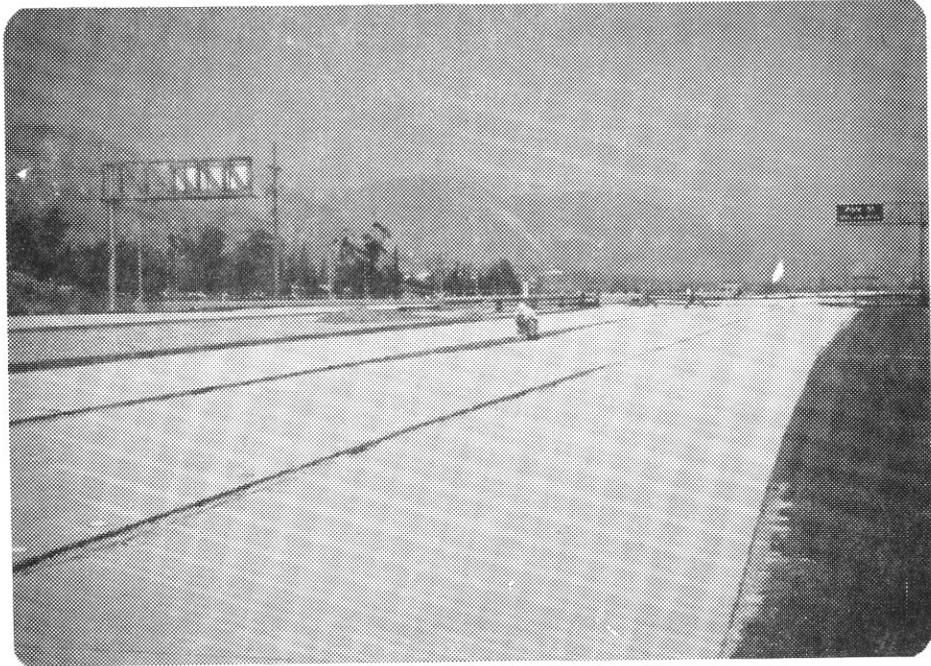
Same location as Photo 106. Note faulting of pavement at longitudinal joint.
